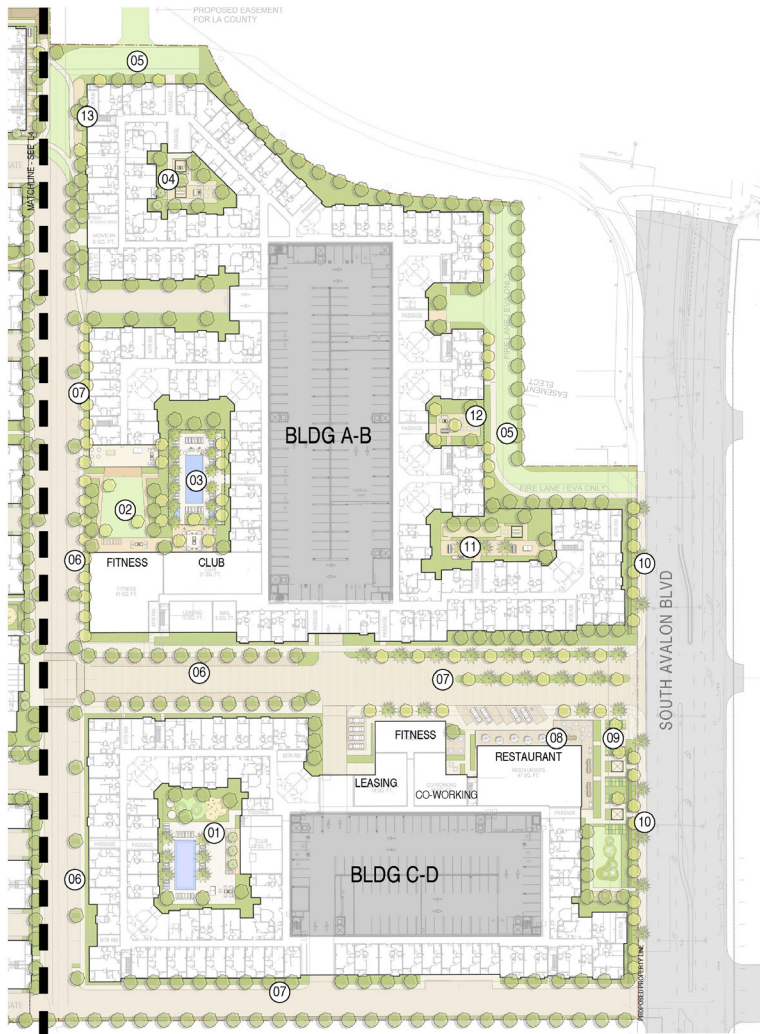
CONCEPTUAL GROUND LEVEL ENLARGEMENT PLAN - EAST
